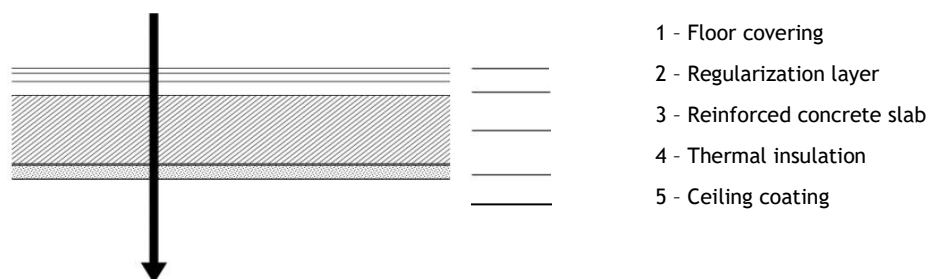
Flooring on the outside and ground floor. Extracted from [35].
